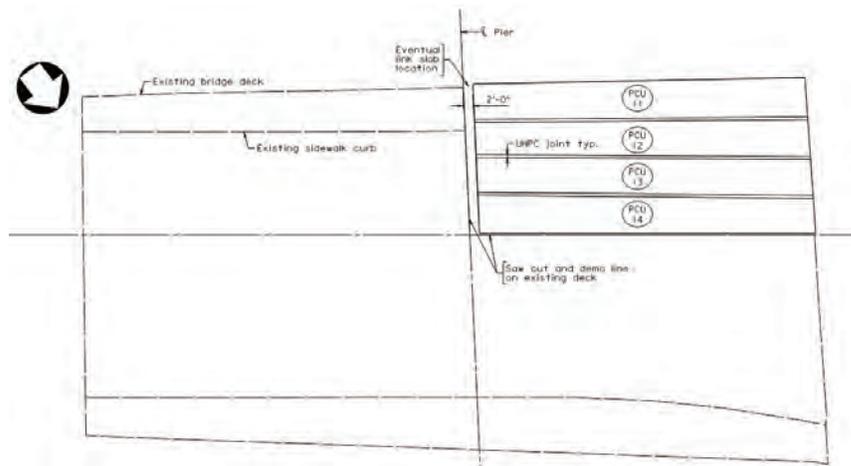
Broad Street Bridge – PCU Units During Construction Sequence
